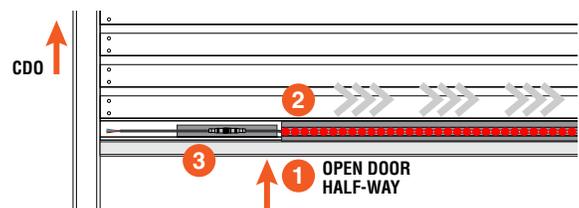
B: Rolling Steel Door LED Strip & Cable Raceway Installation
